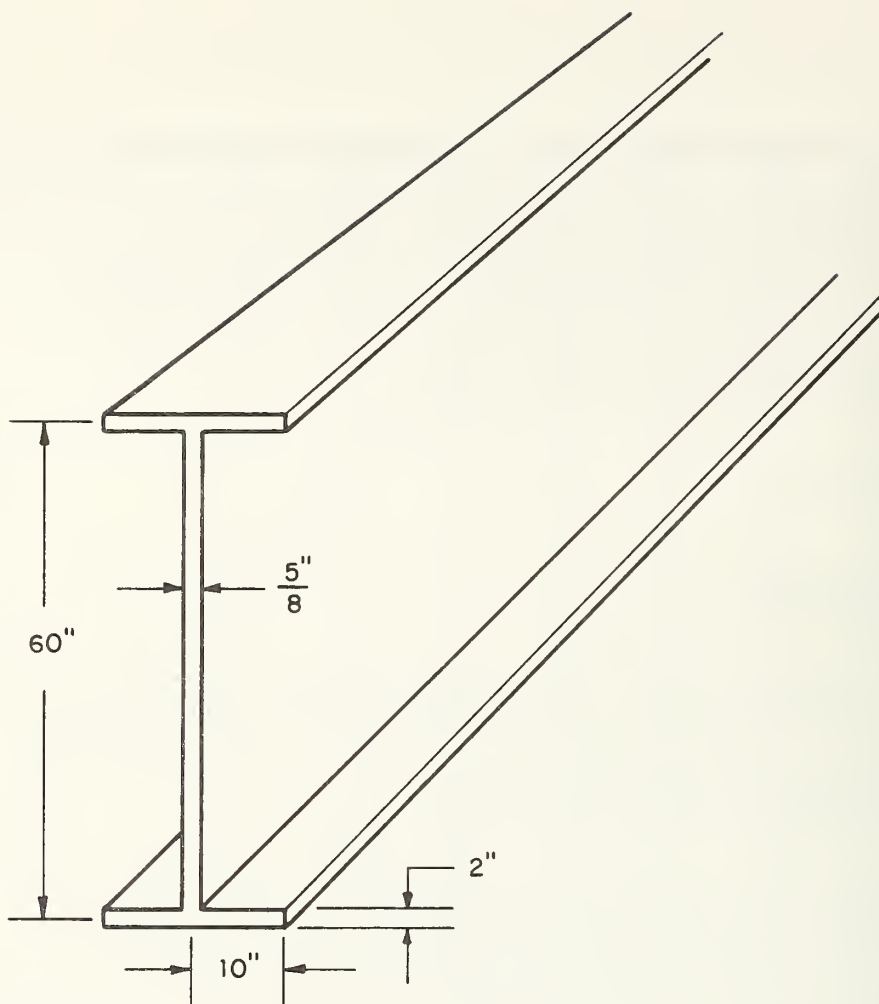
TYPICAL STEEL PLATE GIRDER DIMENSIONS
